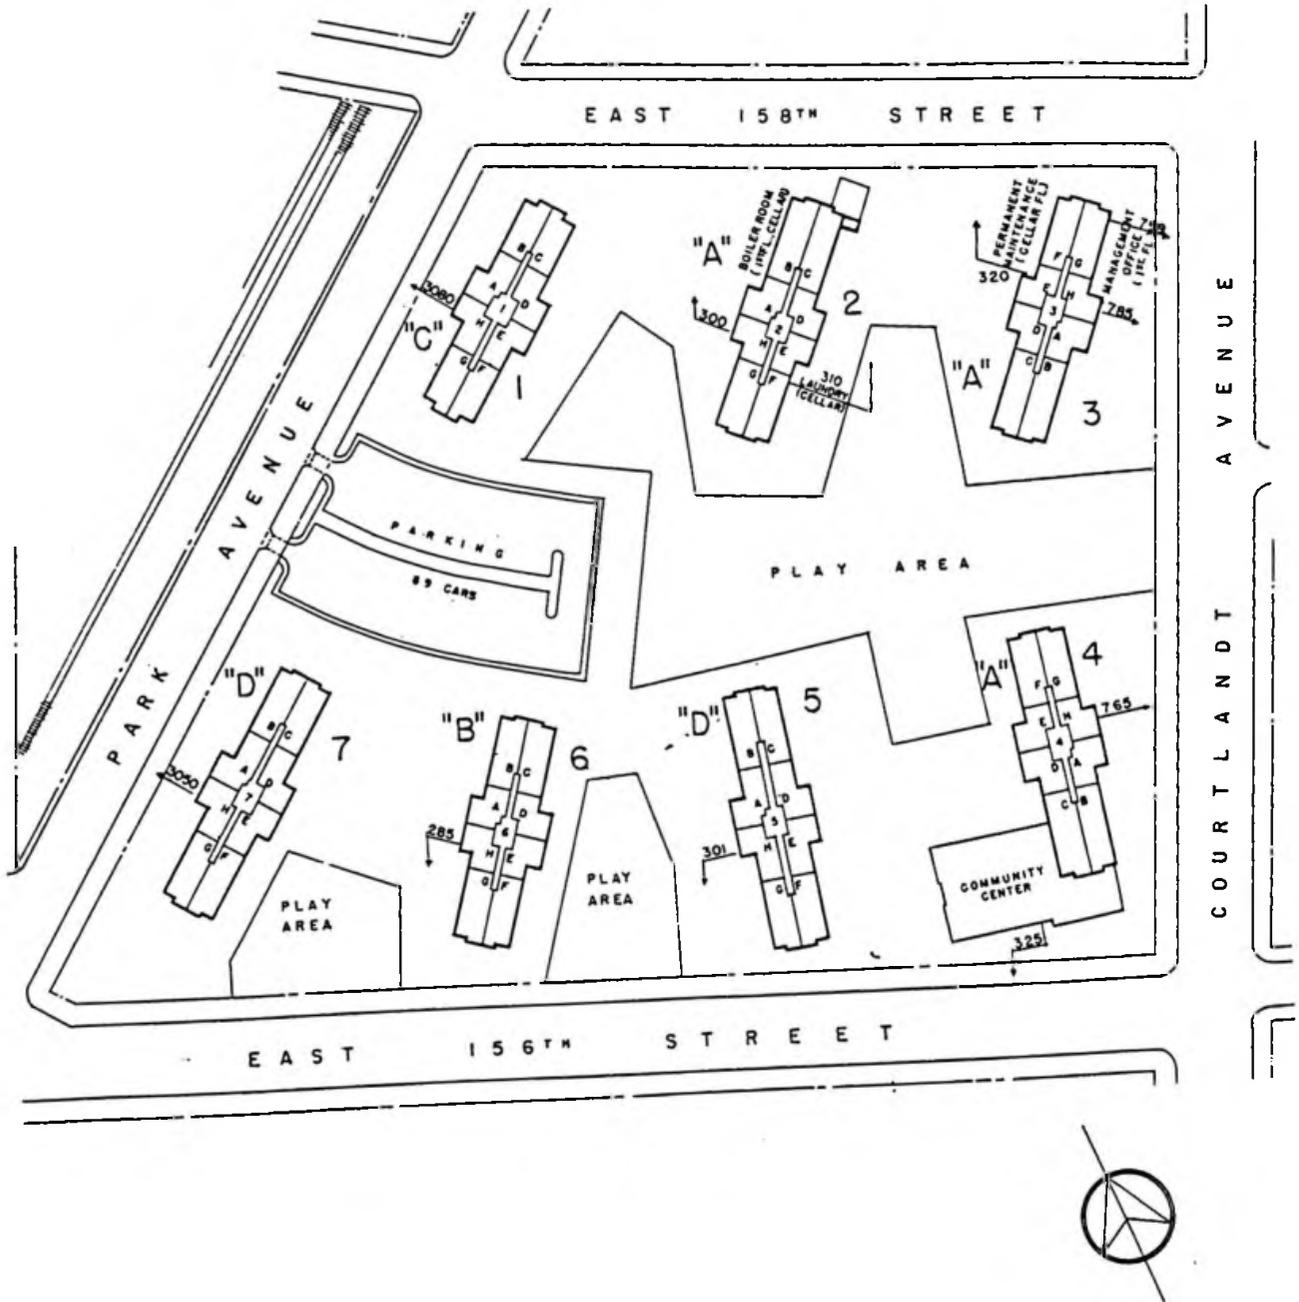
Building/Unit Plans for Andrew Jackson Houses, Bronx
